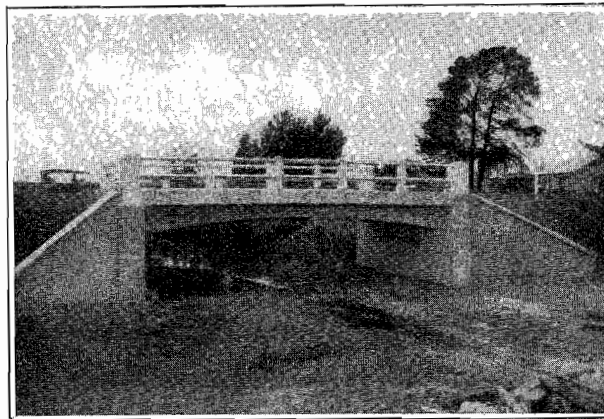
Toomuc Creek bridge, near Pakenham, Prince's Highway East, Section 1. Single-span rigid frame construction.
